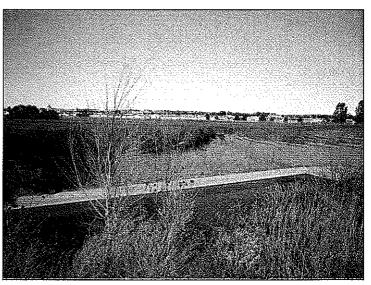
Eagleview Side Channel Weir and Pond Outflow Spillway.
